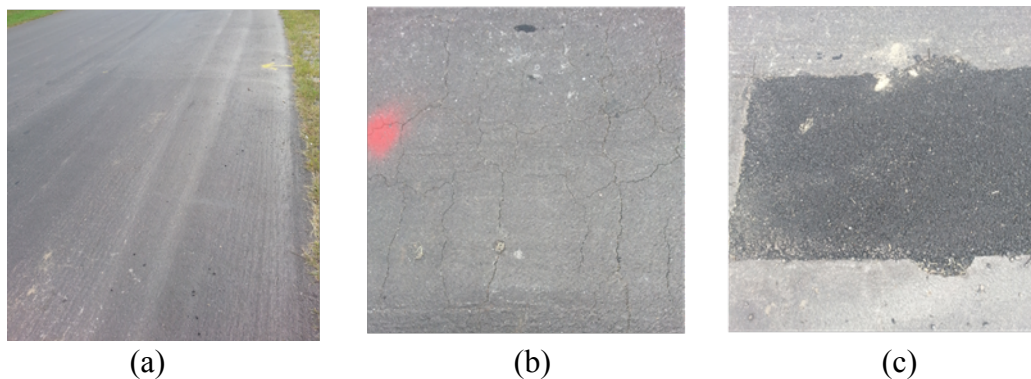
Independence Boulevard Recycling (August 2013): (a) overall section, (b) pavement cracking, and (c) sample patching,
